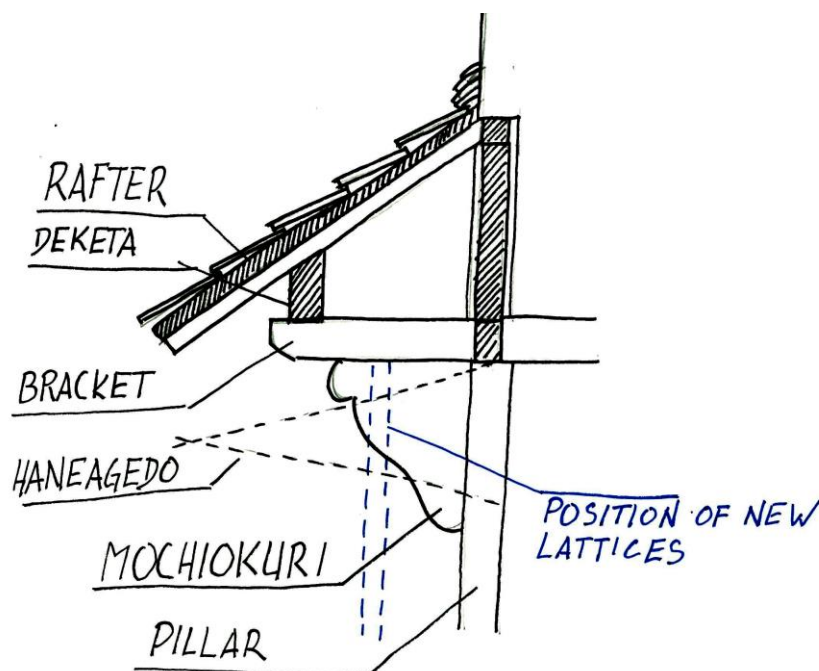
Sketch of the cross-section of a façade and its transformation from haneagedo-type sash shutters to lattices.
